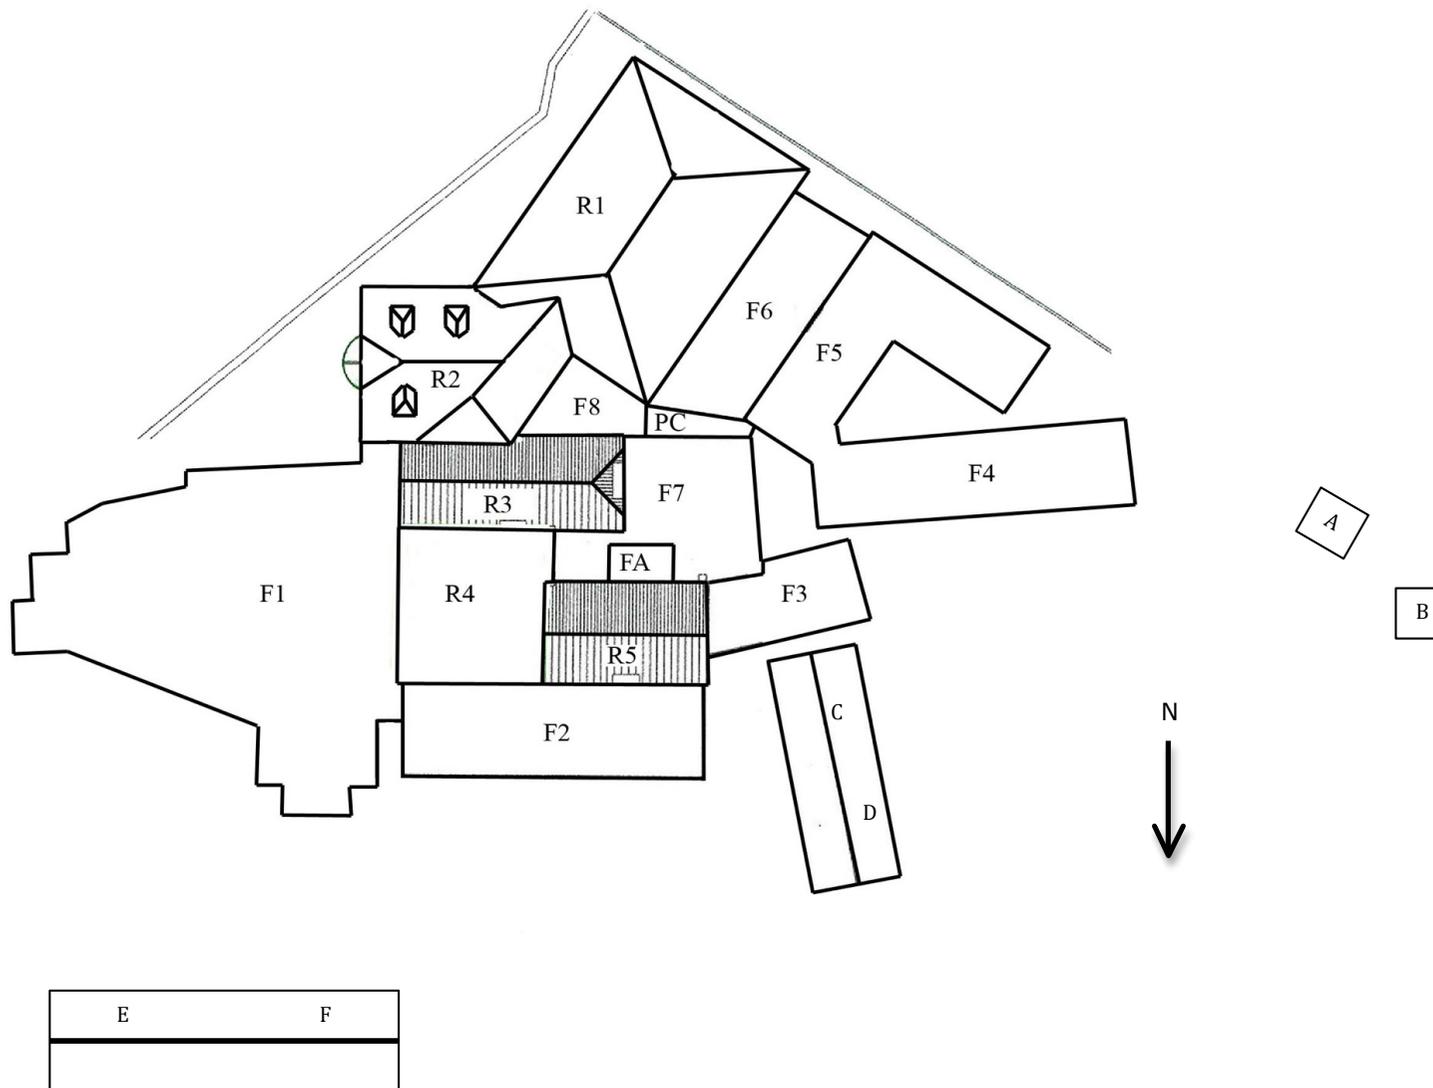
Roof plan of hotel (the location, shape and orientation of buildings labelled A, B, E and F are indicative and not to scale).
